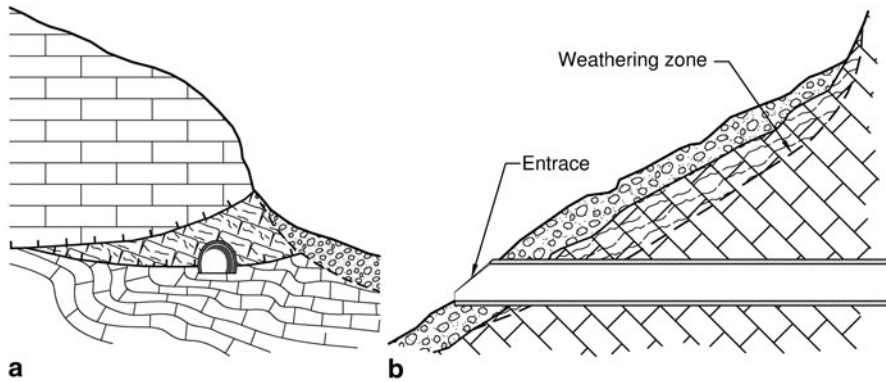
Examples of a geological structure potentially interested by excavation interactions with the slope stability: a Overthrust zone, b portal stretches
